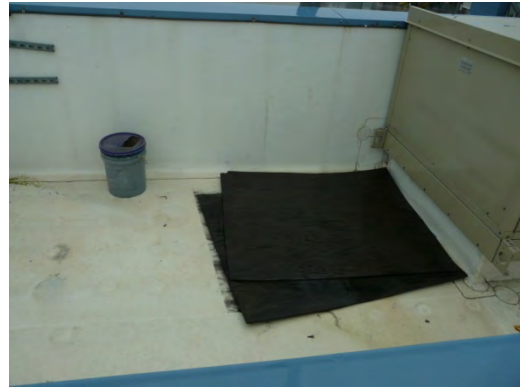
Construction debris remaining on roofs: bucket and plywood sheets
